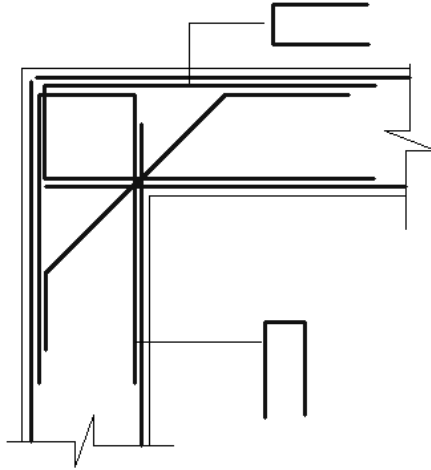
20 Detailing of Wall Intersections and Corners Recommended by ACI 315-92.
